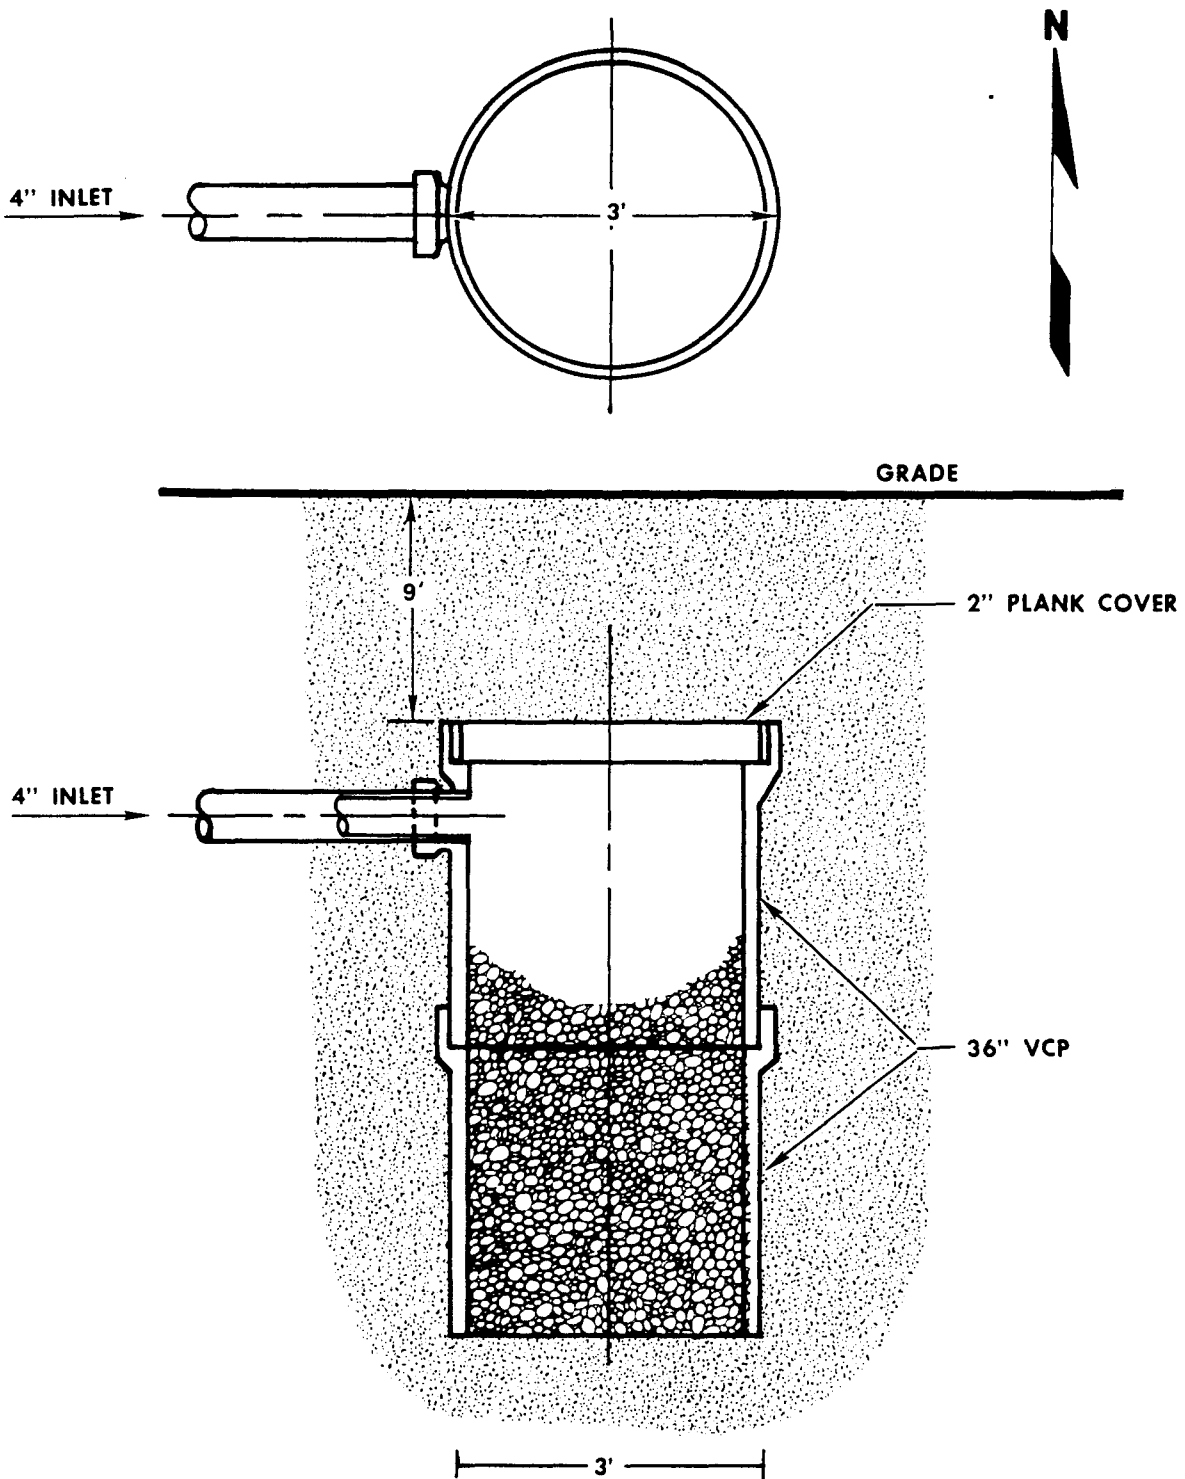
216-Z-14 French Drain Plan and Section. (D)
